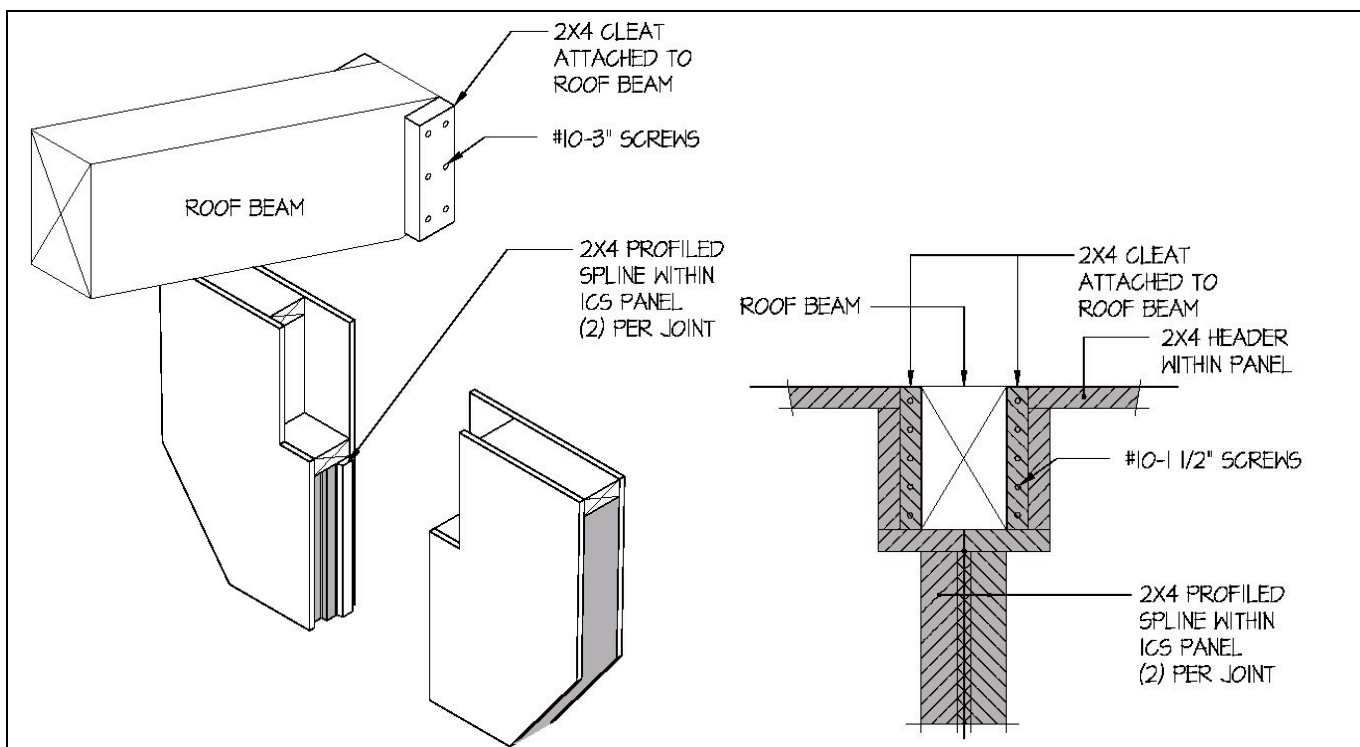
Beam Pocket at Top of Wall: Beams or girders to support the second-floor wall are usually set into beam pockets at the top of wall panels. If the pocket does not align with a wall panel seam, the foam is routed-out on both sides and below for 2" x 4" scabs.
